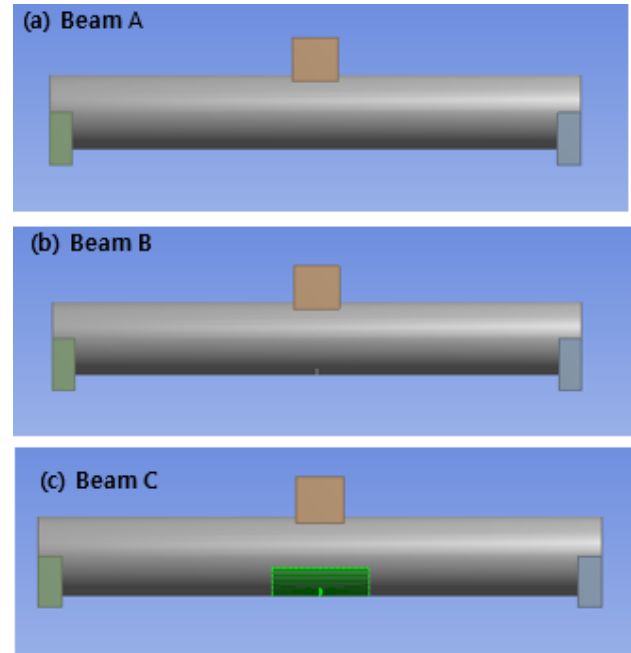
CHS beams: (a) Undamaged beam (Beam A); (b) Notched beam (Beam B), (c) Repaired notched beam
